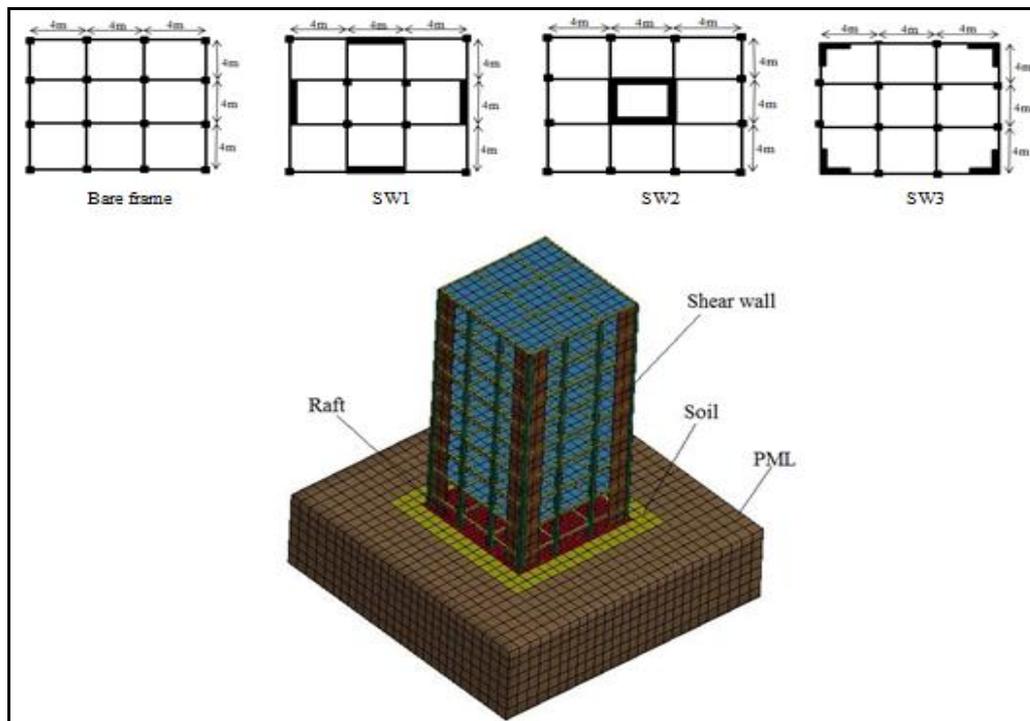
Plan of bare frame and frame with various locations of shear wall and Idealized soil-foundation-structure model
